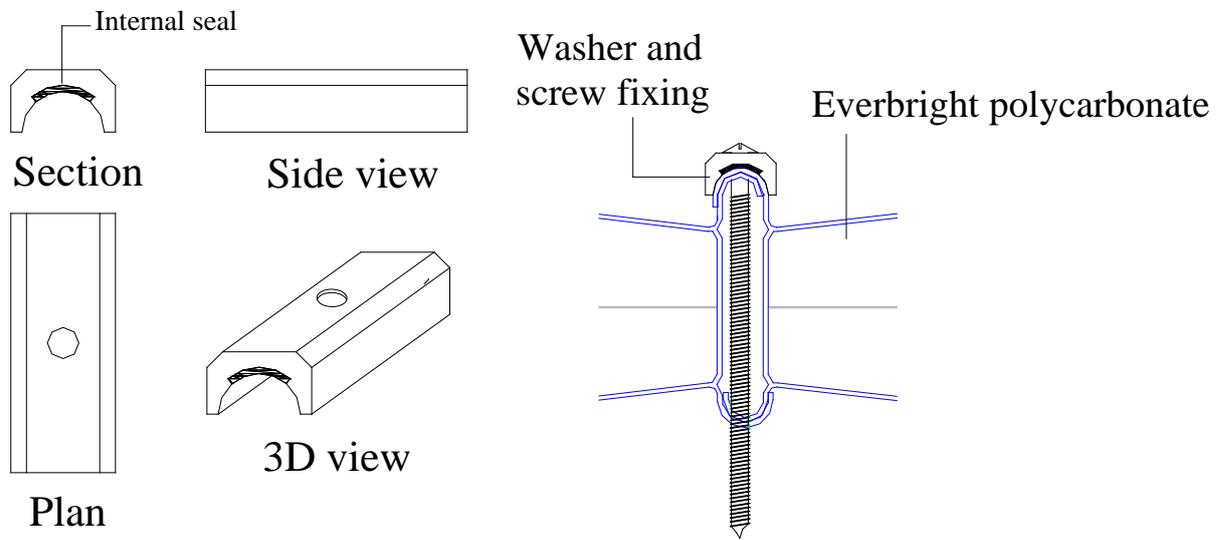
Detail drawings of aluminium washer and fixing installation (provided by client)
